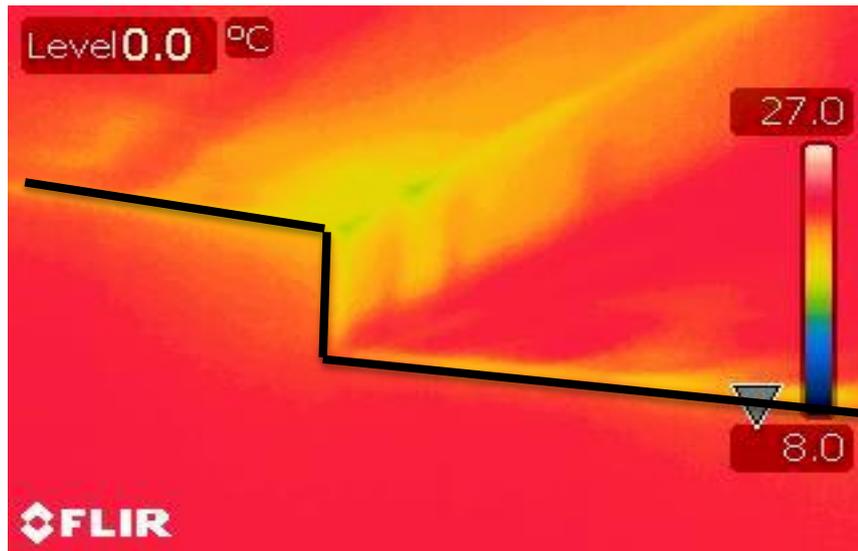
MVHR Duct Housing – Drop Down Section From Ceiling Phase 2 Heat Loss
